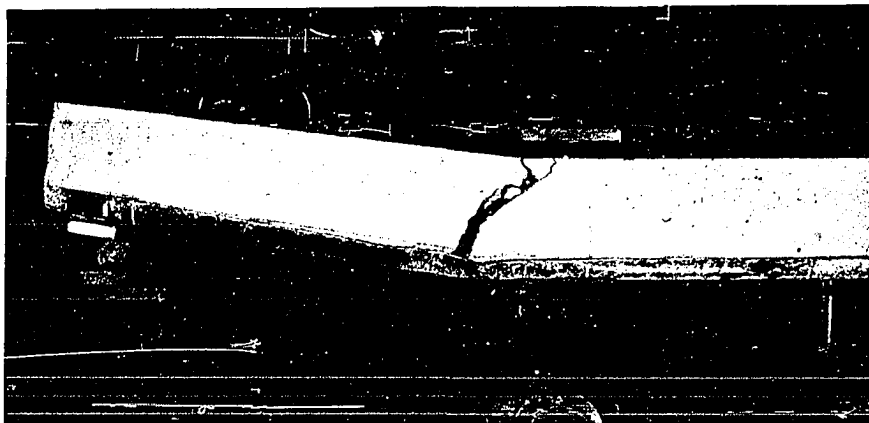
Typical shear-bond failure crack of beam constructed with steel deck G. Also showing end-slip
